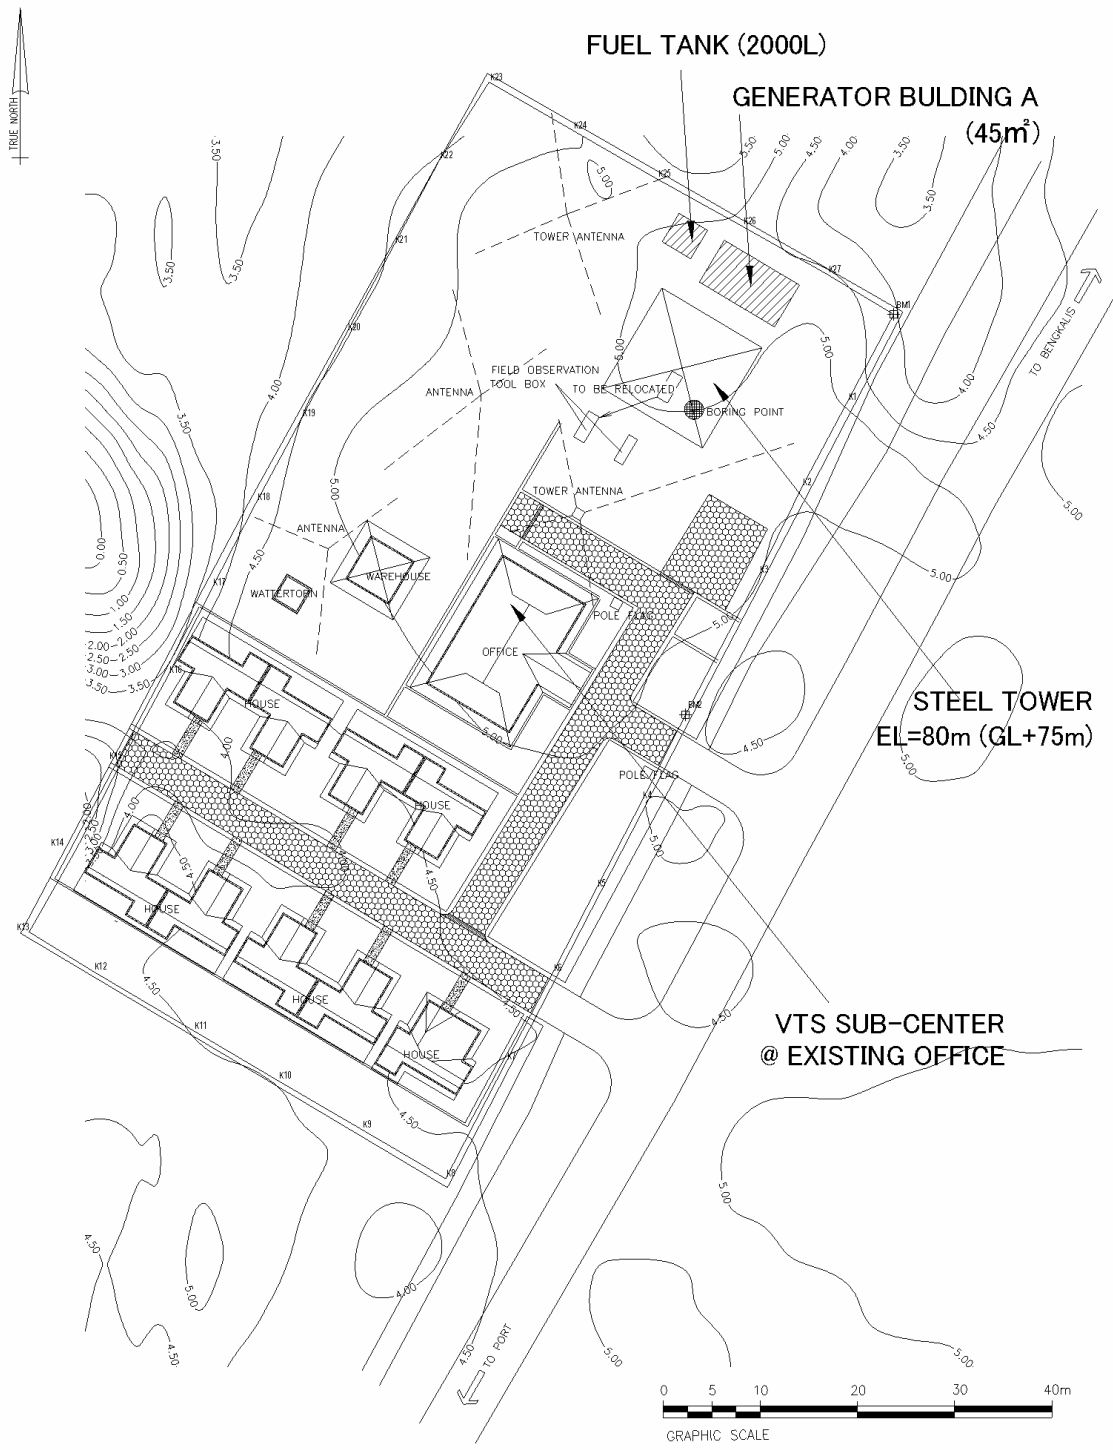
Plot Plan of Facilities (4) Tanjung Berakit
